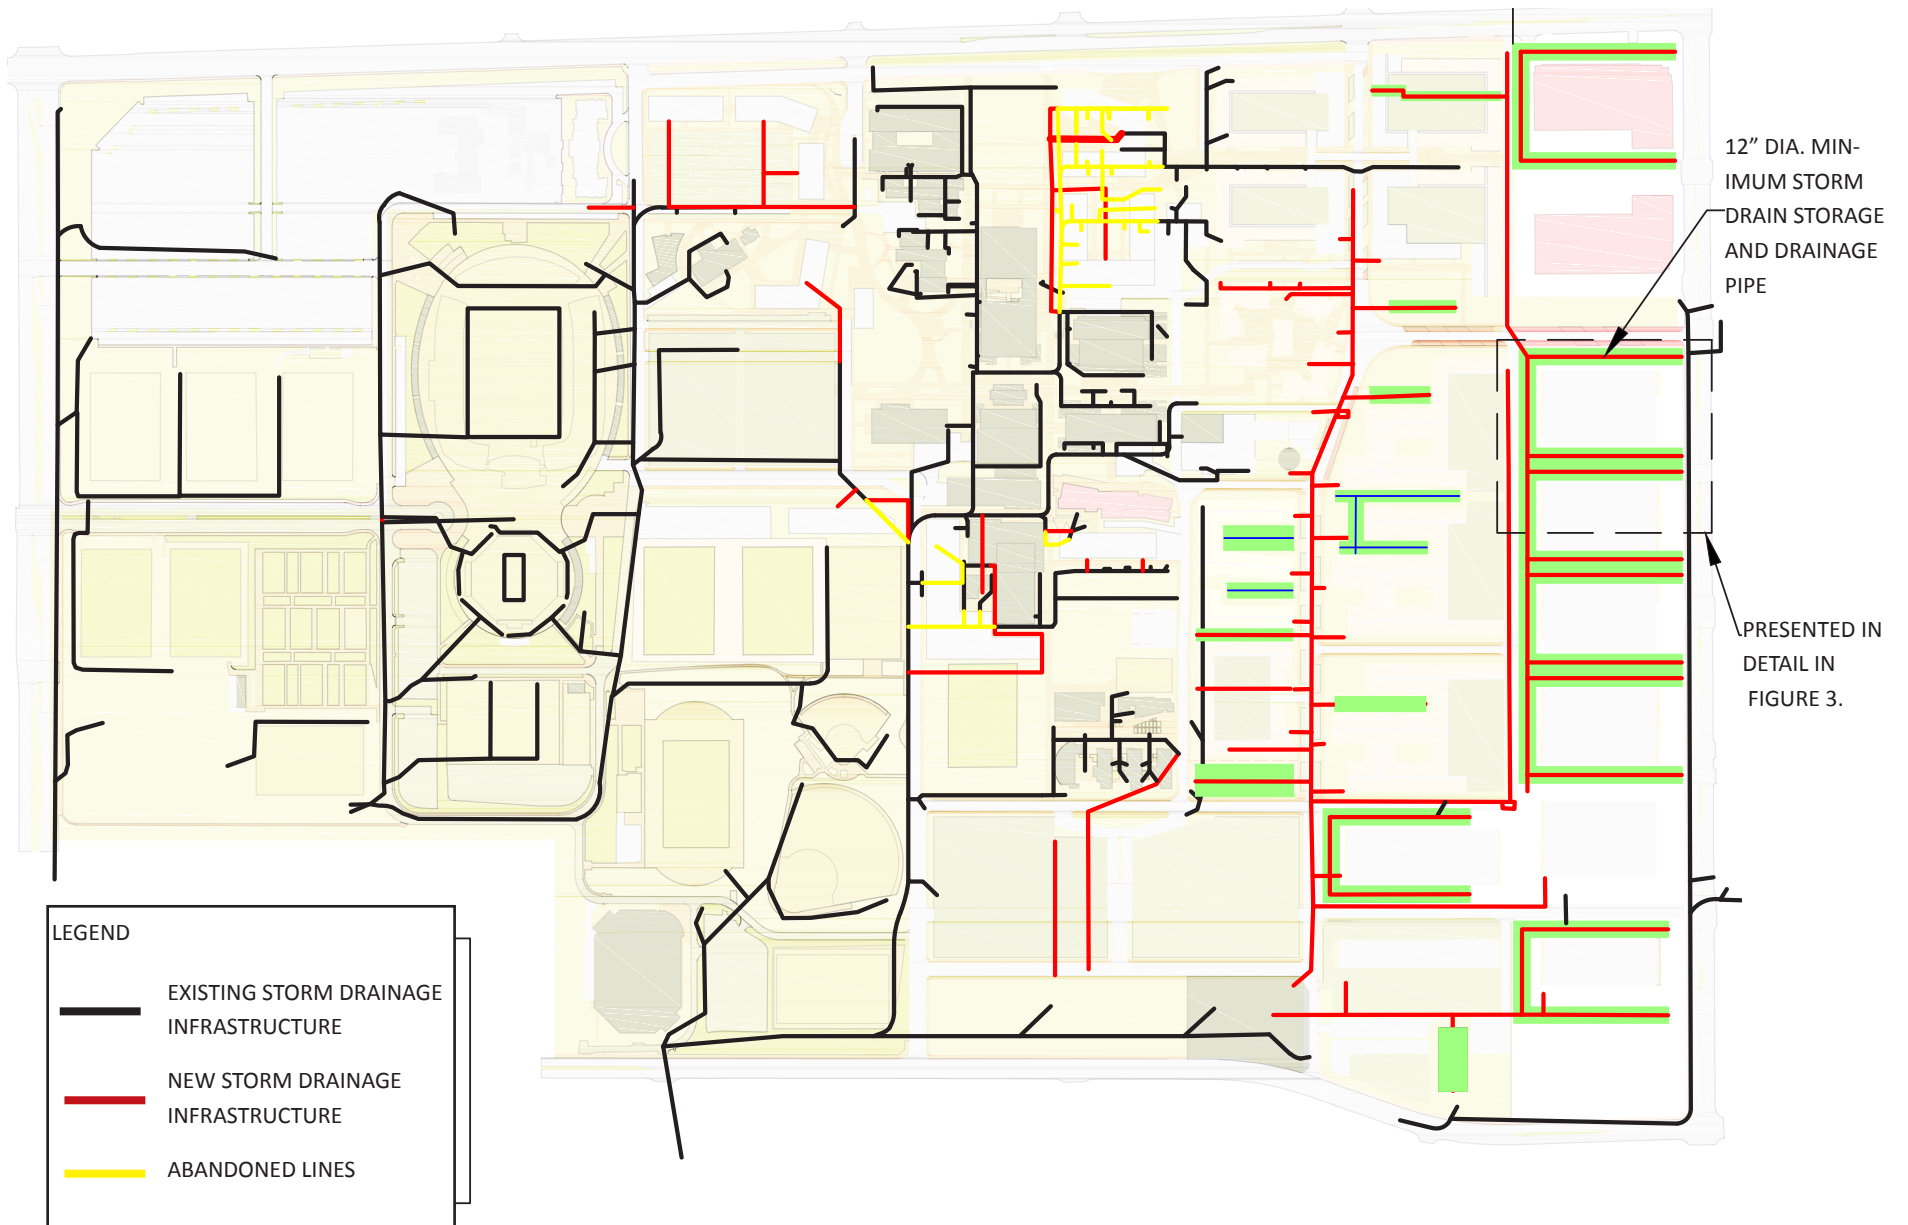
EXISTING AND NEW STORM DRAINAGE INFRASTRUCTURE
